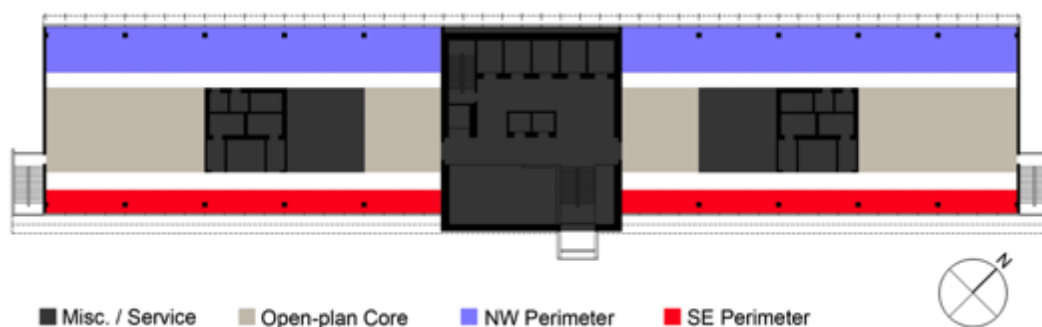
Generic floor plan showing location of open-plan lighting zones studied.
